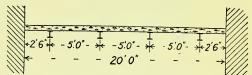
Concrete Steel Floor Loaded Equally.
